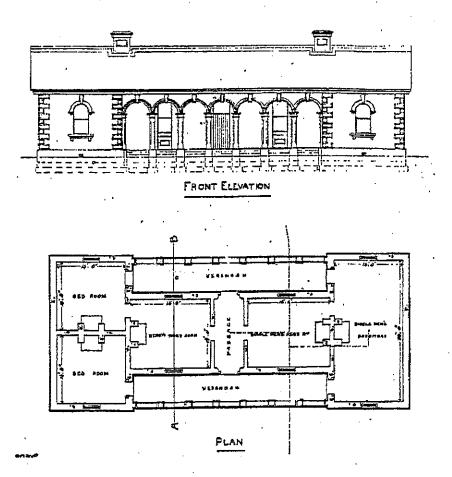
Plan and Front Elevation of Police Barracks, (DPW&S Plan Room PC 321/16 detail)
